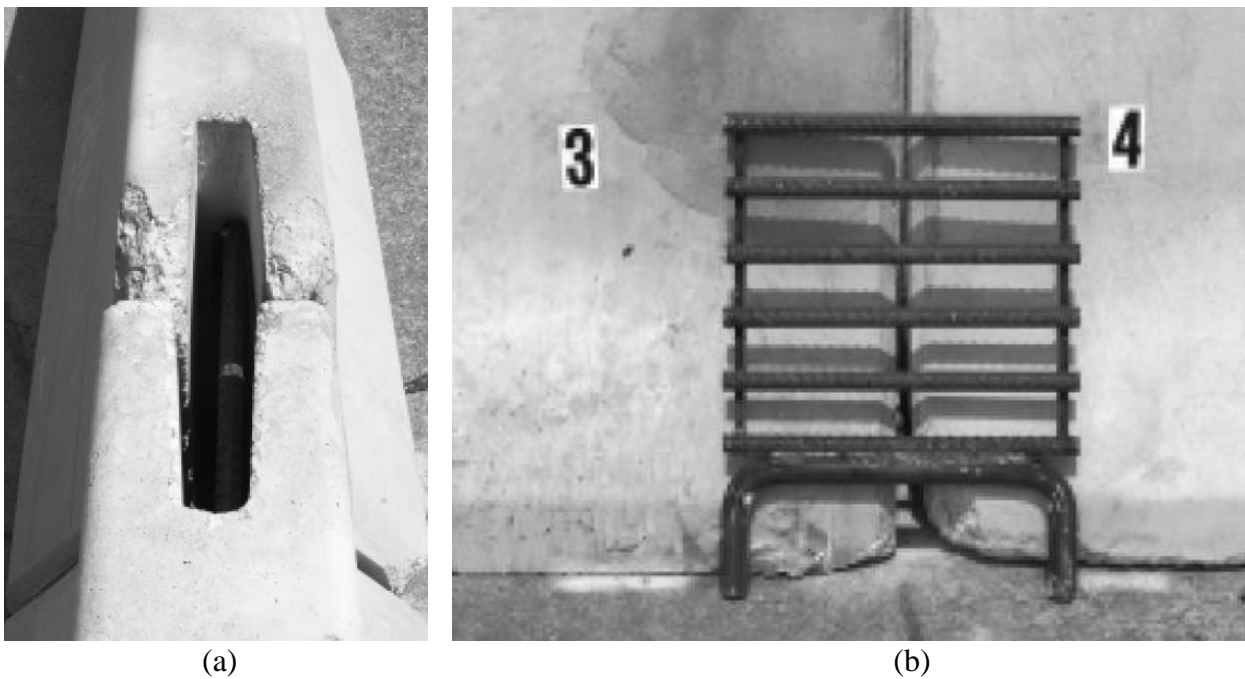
U-Bar Connection, (a) Keyway and (b) Key, Test No. 441621-2 [53]
